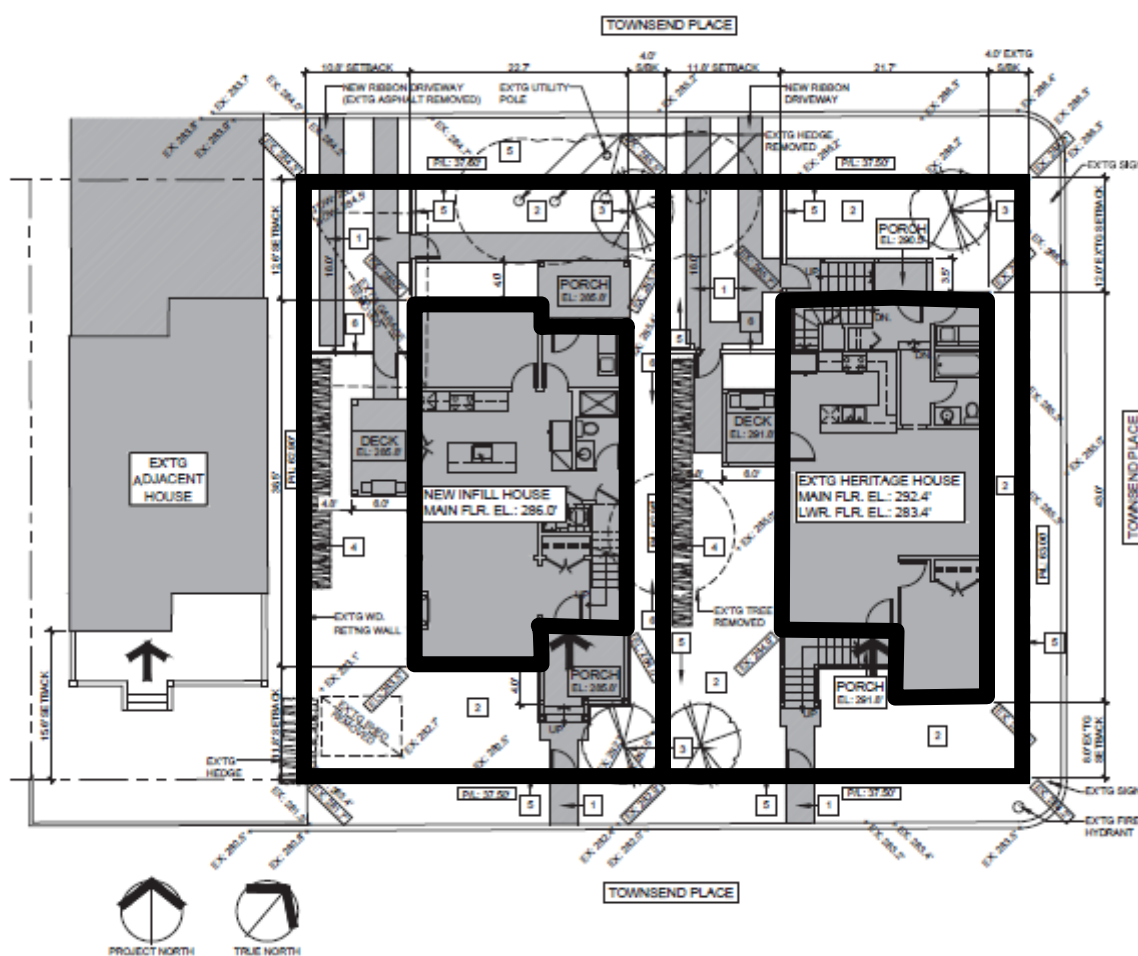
Project site plan with emphasis added in thicker lines to show the proposed lots and rough house footprints
